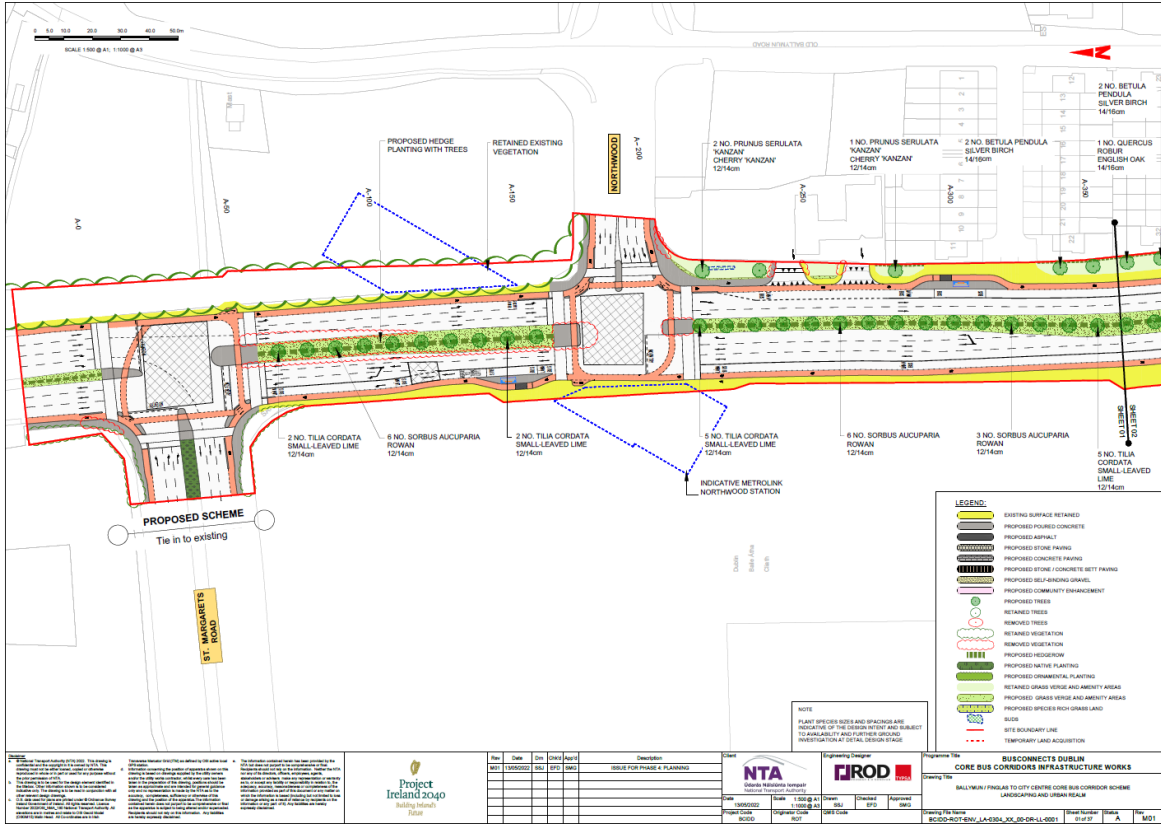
Landscape General Arrangement Drawing Sheet 1 at Ballymun
